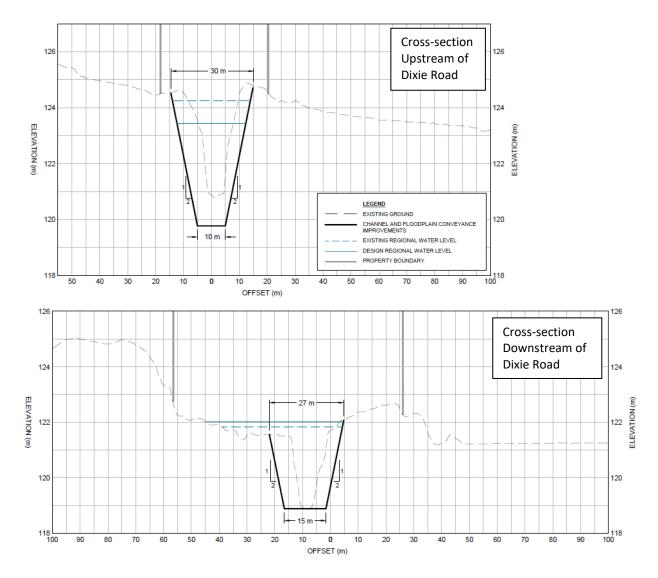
Dixie Area Alternative Solution 1: Typical Cross-sections Upstream and Downstream of Dixie Road
